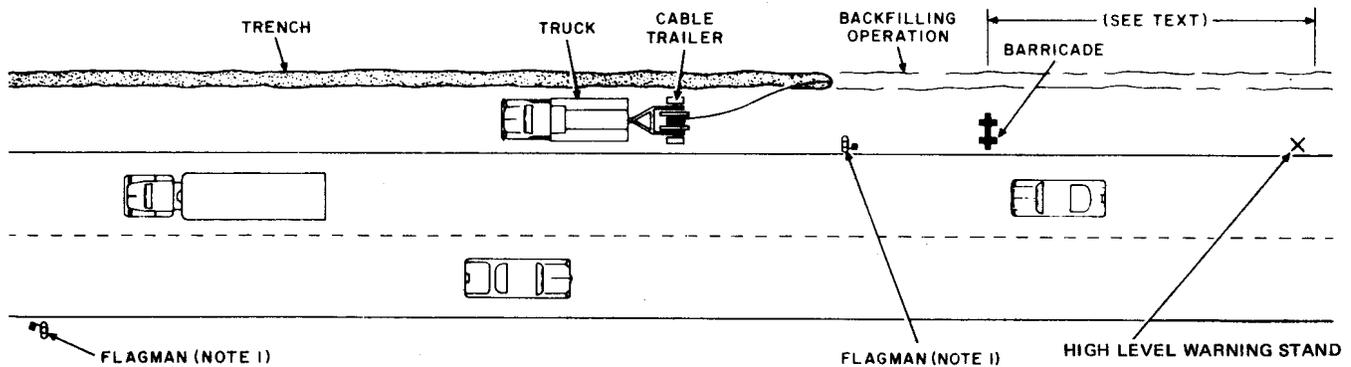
Placement of Warning Devices on Street or Highway - Underground Plant on Shoulder
